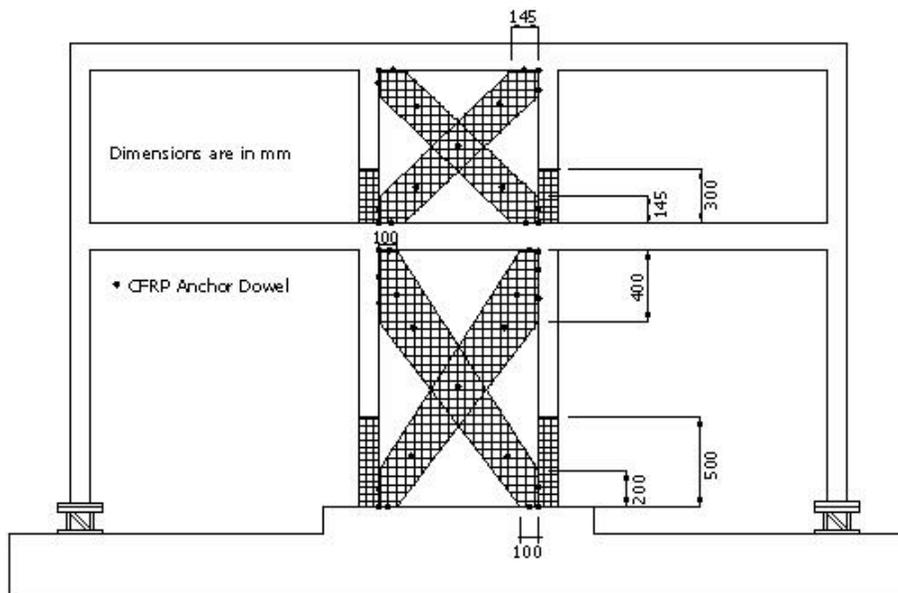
Configuration of the CFRP and Location of Anchor Dowels
